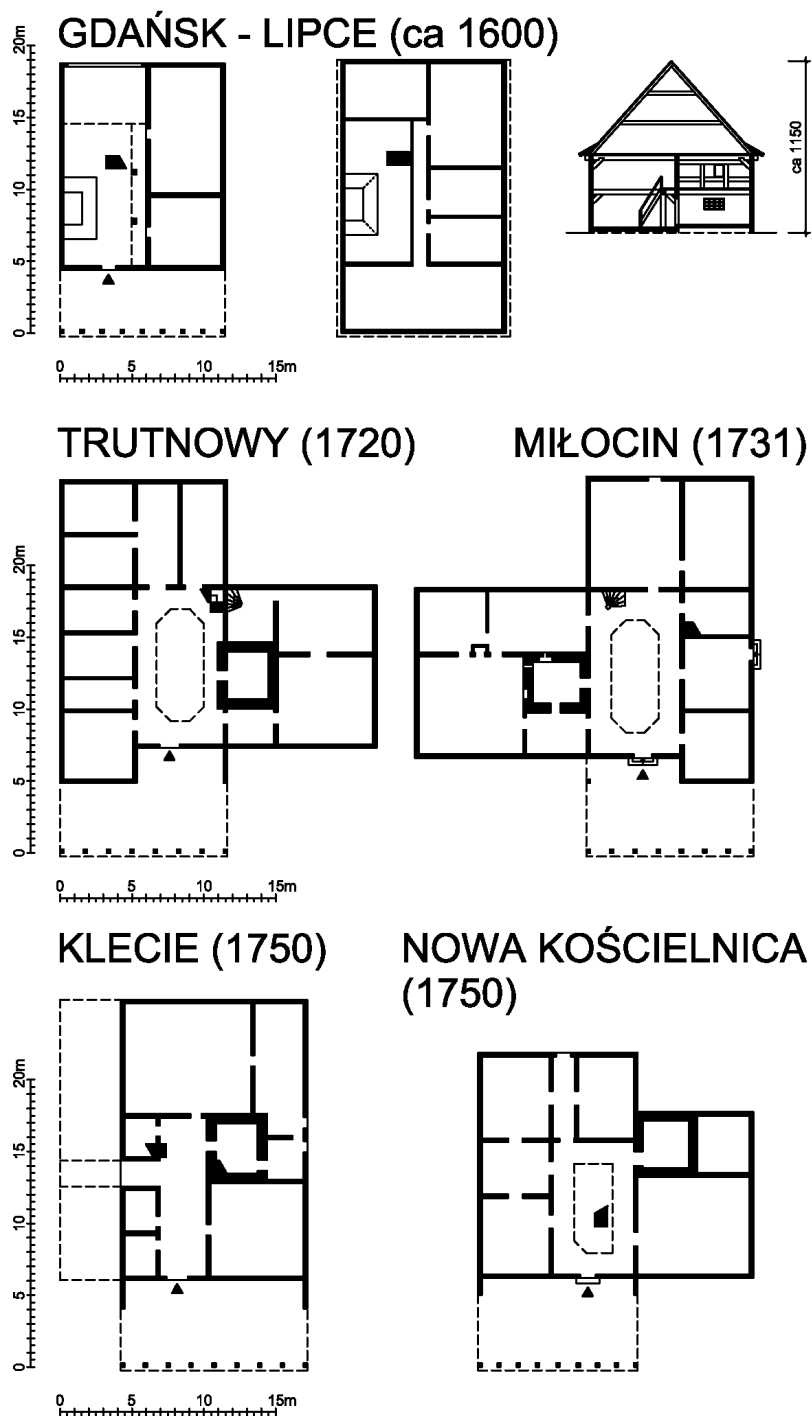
Plans of portico houses; Lipce, Miłocin, Nowa Kościelnica - reconstructions of the original plans after Kloepfel (Kloepfel 1924); Klecie - reconstruction of the original plan after Schmid (Schmid 1919) and Trutnowy.
